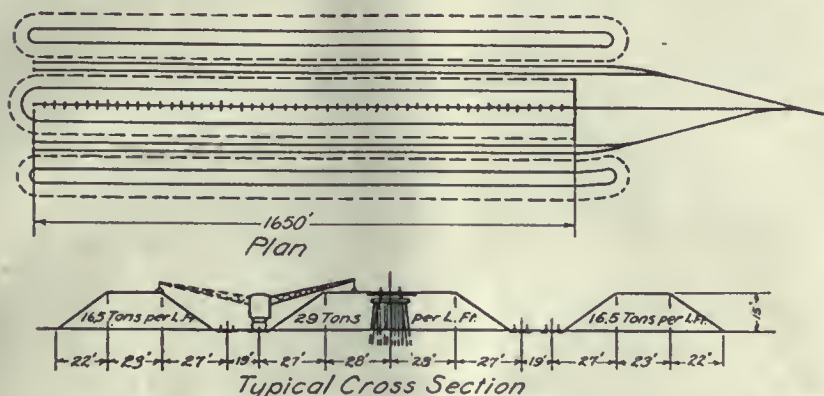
PLAN AND SECTION ILLUSTRATING STANDARD COAL STORAGE SYSTEM OF THE NEW YORK, NEW HAVEN, AND HARTFORD RAILROAD (TONNAGE GIVEN PER LINEAR FOOT)
